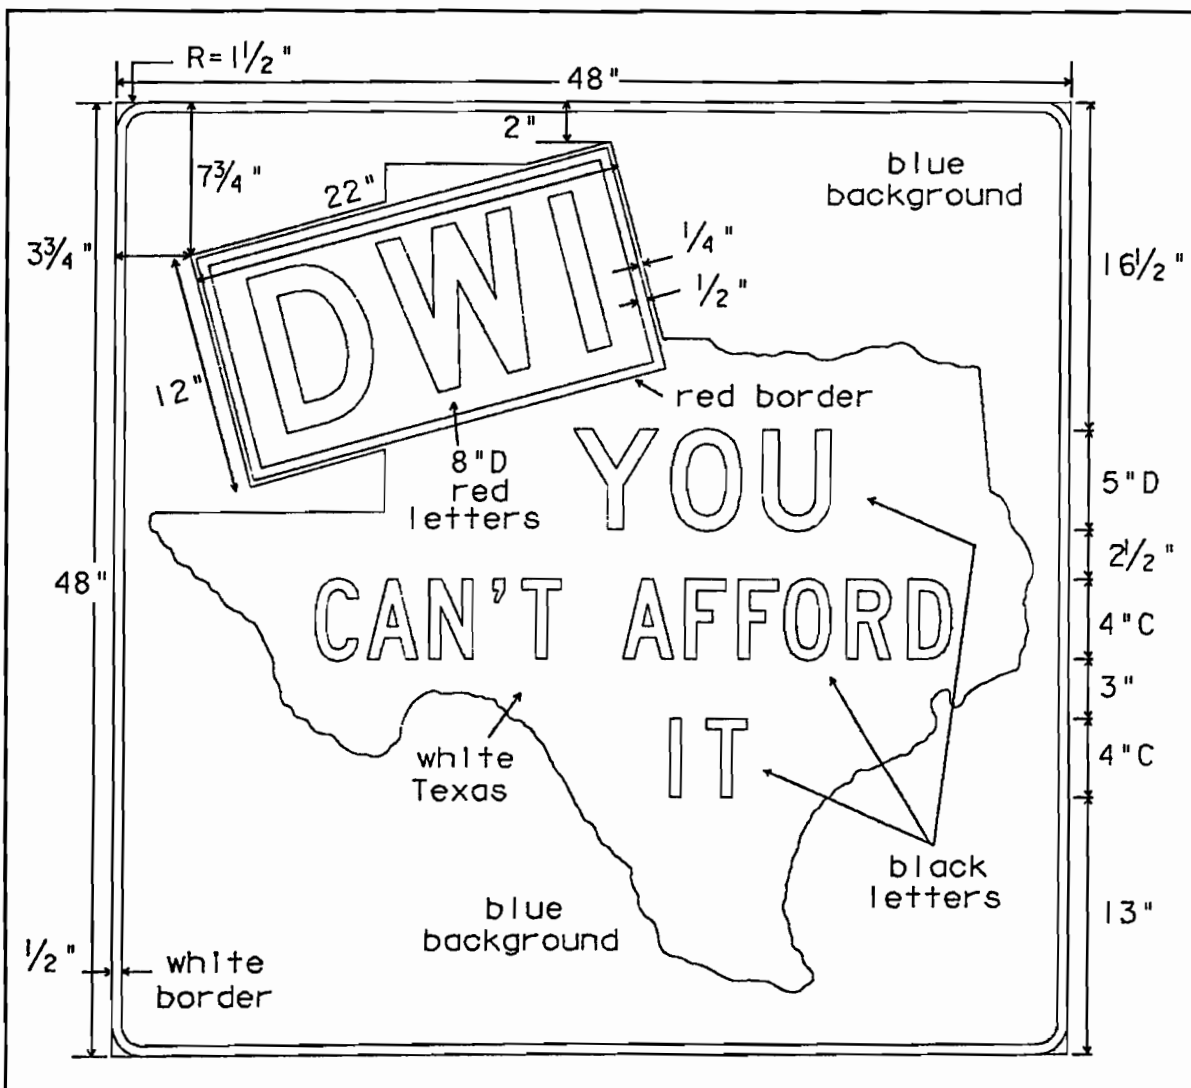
DWI — YOU CAN'T AFFORD IT sign details.
